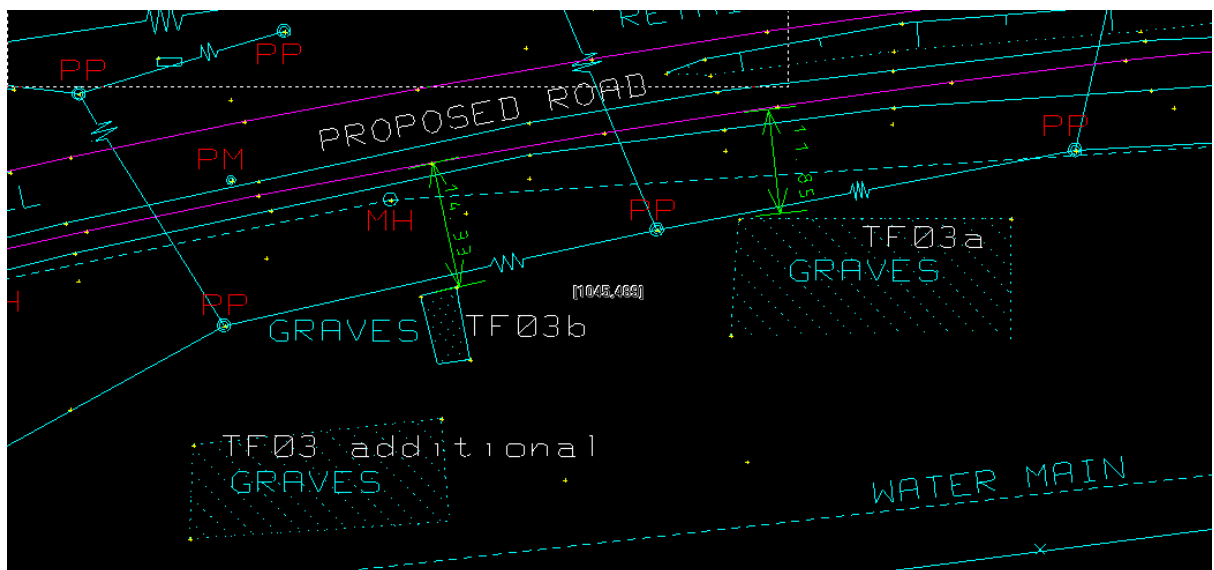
Position of grave site TF03 adjacent to the new road alignment (Source Neil Brand).
